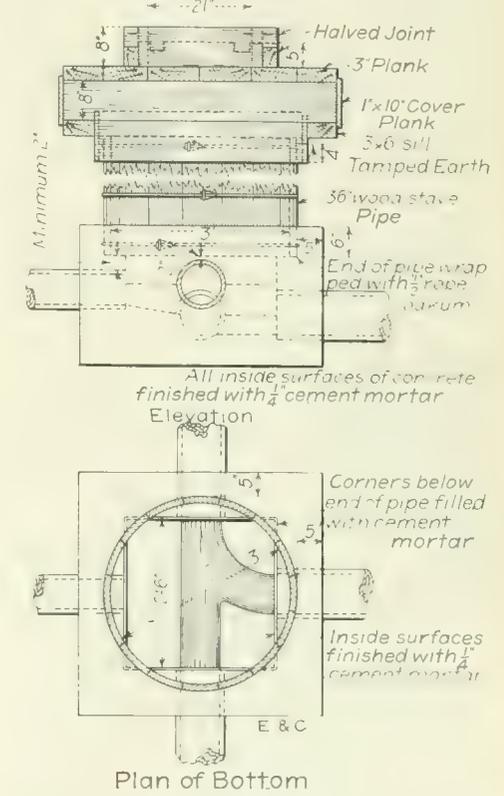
Standard Deep Sanitary Sewer Manhole of Wood Stave Pipe With Concrete Bottom and Timber Top, Panama-Pacific Exposition Sewerage System.
